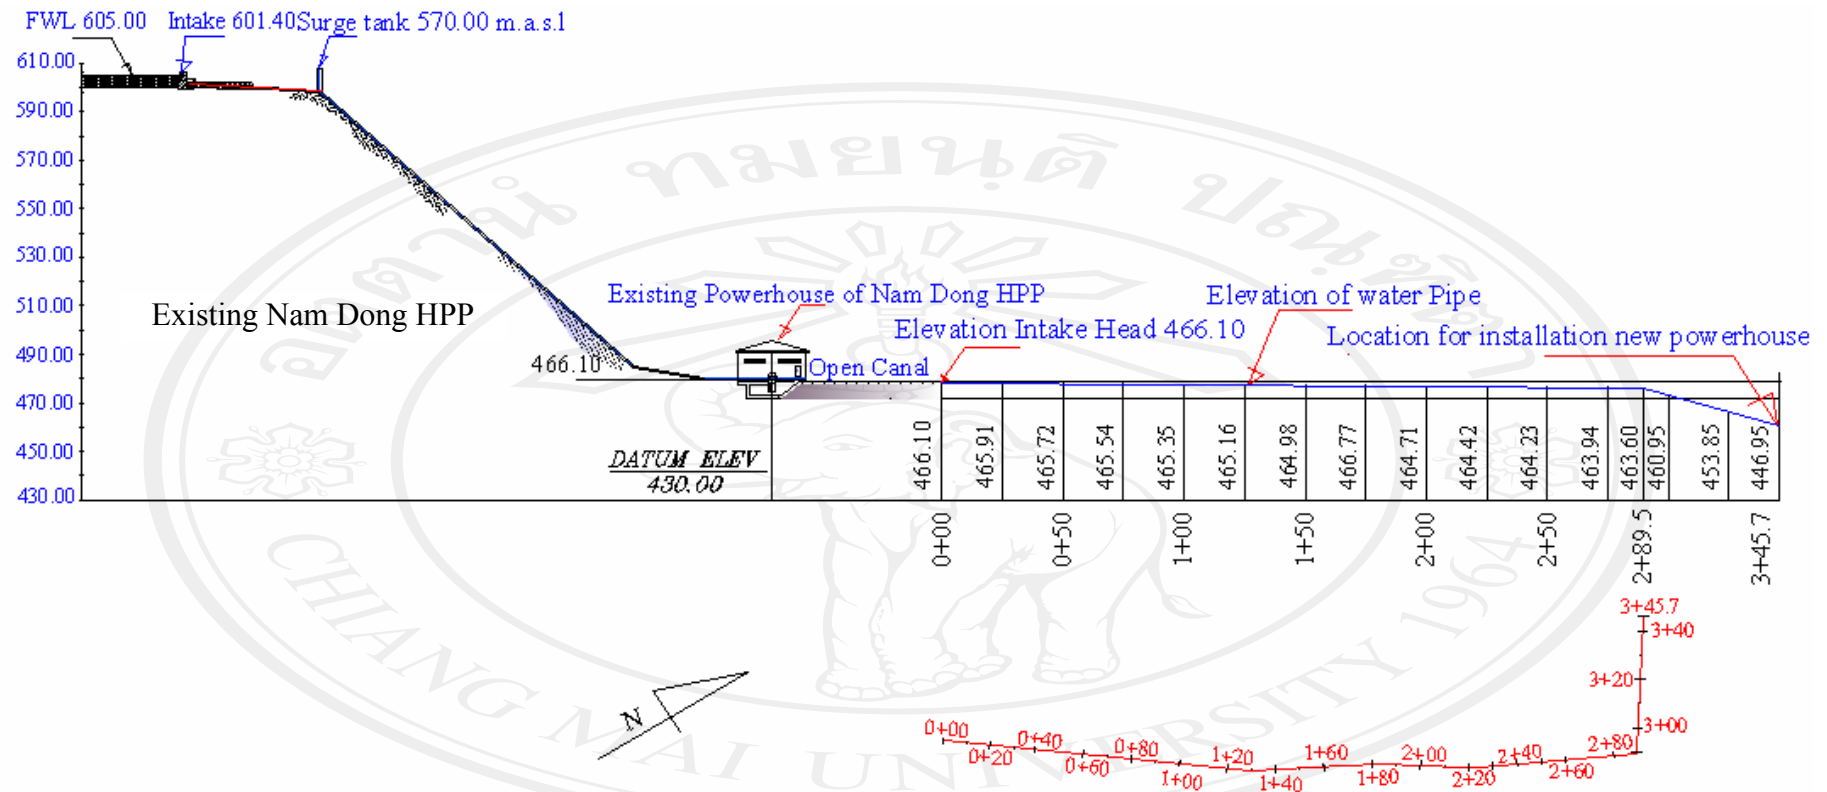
The out line of elevation and distance from intake to powerhouse (Site reconnaissance March, 2007)
